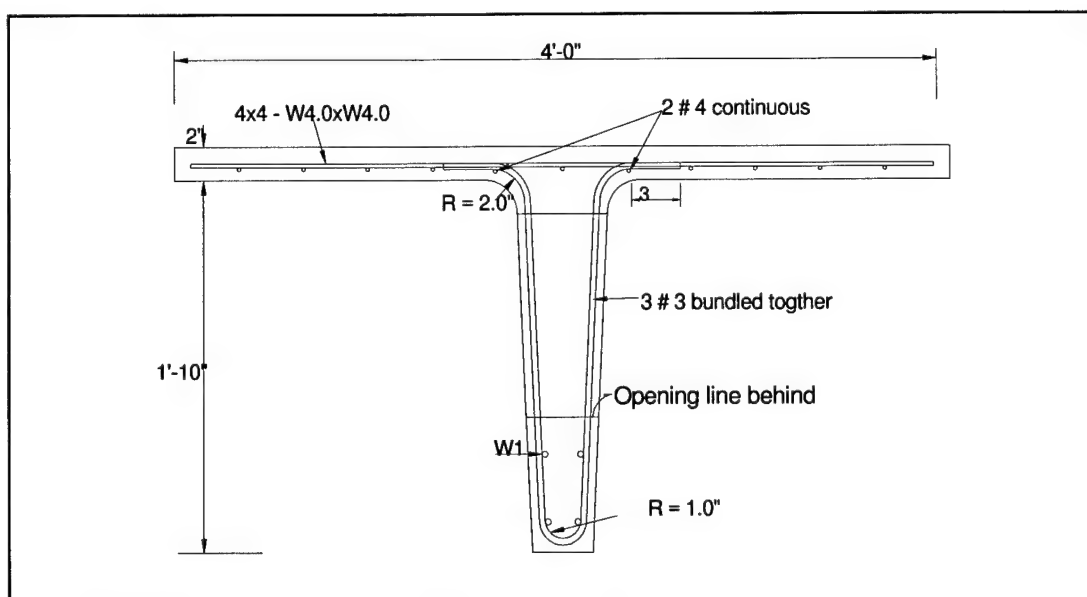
Reinforcement details at opening edges of Series 2 specimens.
